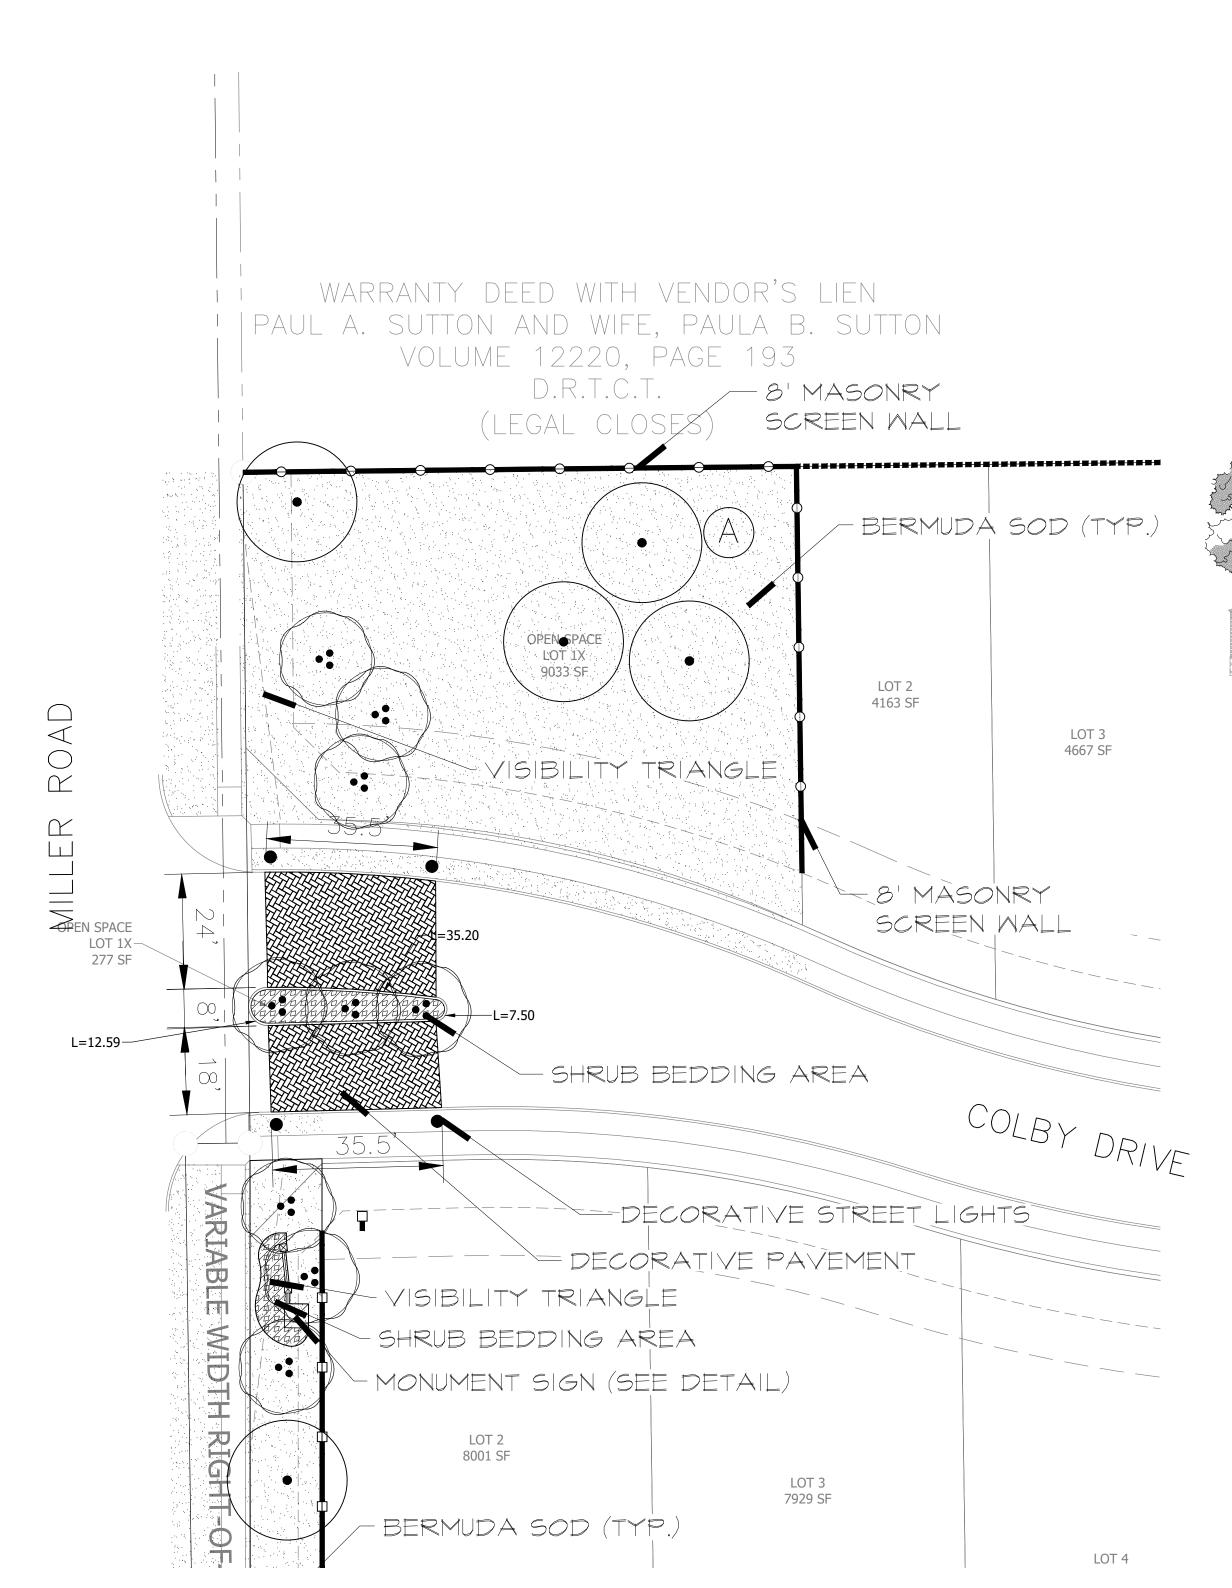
EXHIBIT "B" DEVELOPMENT PLAN COLBY CROSSING PHASE 2
